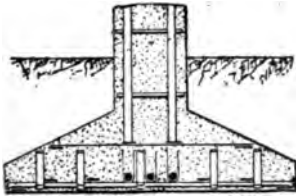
Footing by Hennebique, with Flat Bar Reinforcement.
